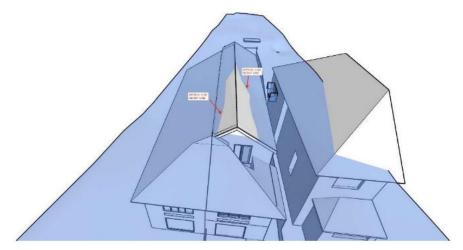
Building height of existing dwelling (8.5m building height plane shown in blue)
